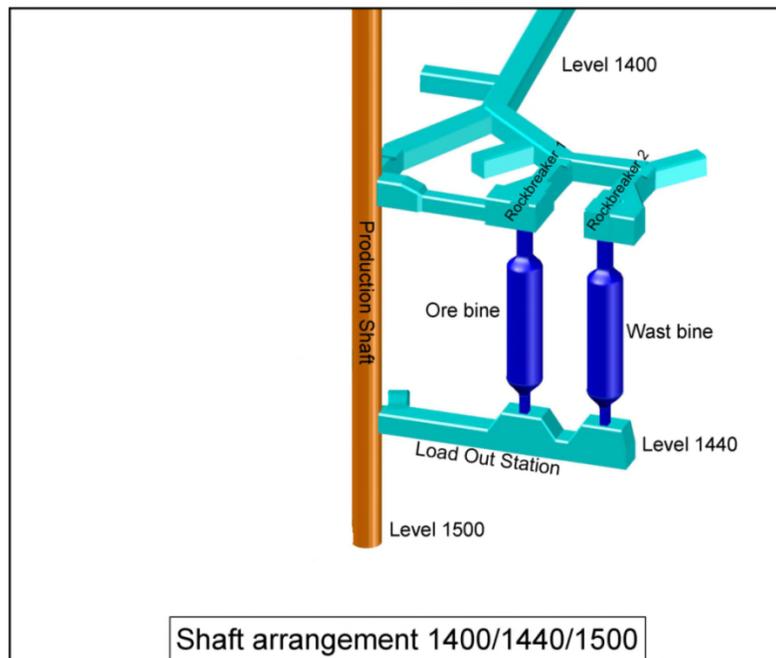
General Arrangement of the 1400-1440 Loading Station
